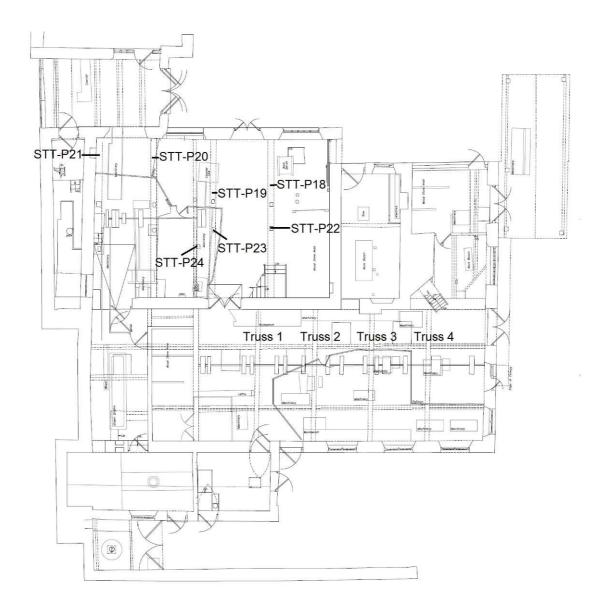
Ground-floor plan, showing the location of samples STT-P18–24 and truss positions in the New Lathe Shed (Greenhatch Group)
